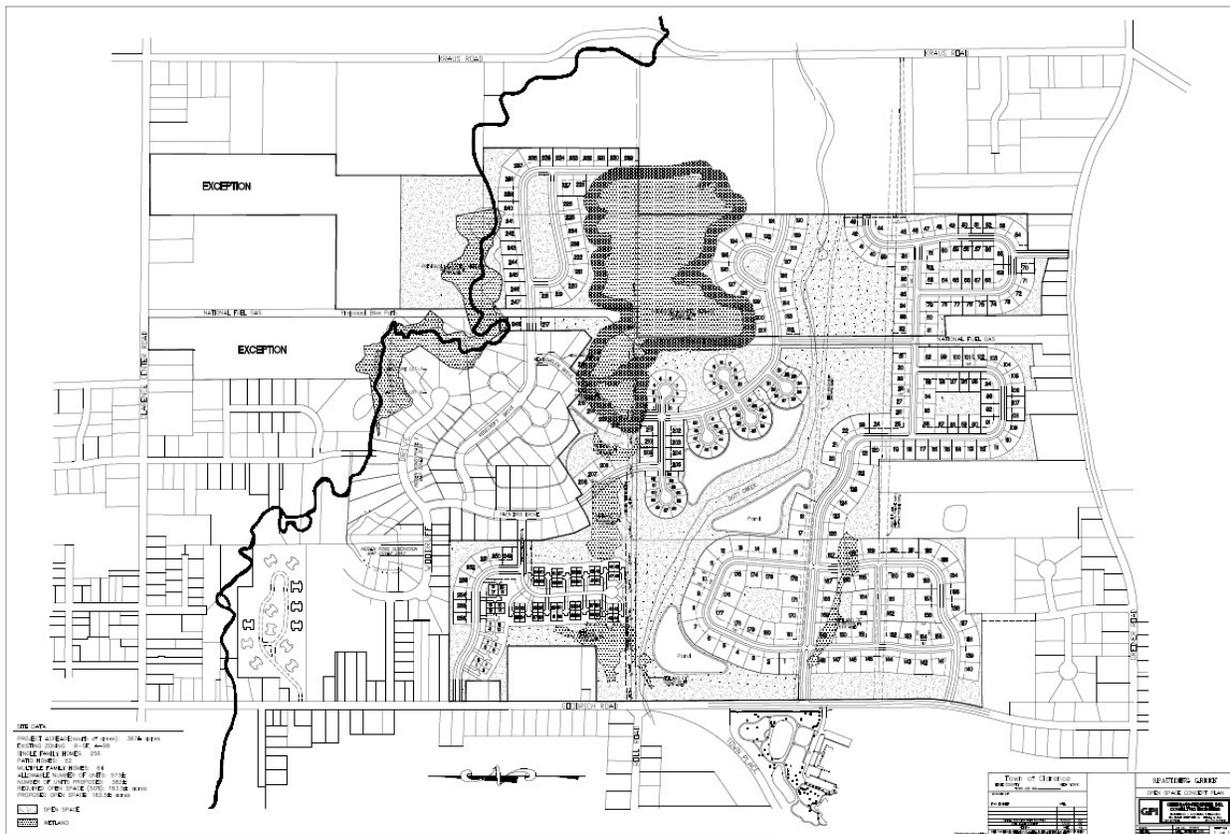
Open Space Design Development Plan, Alternative 2
